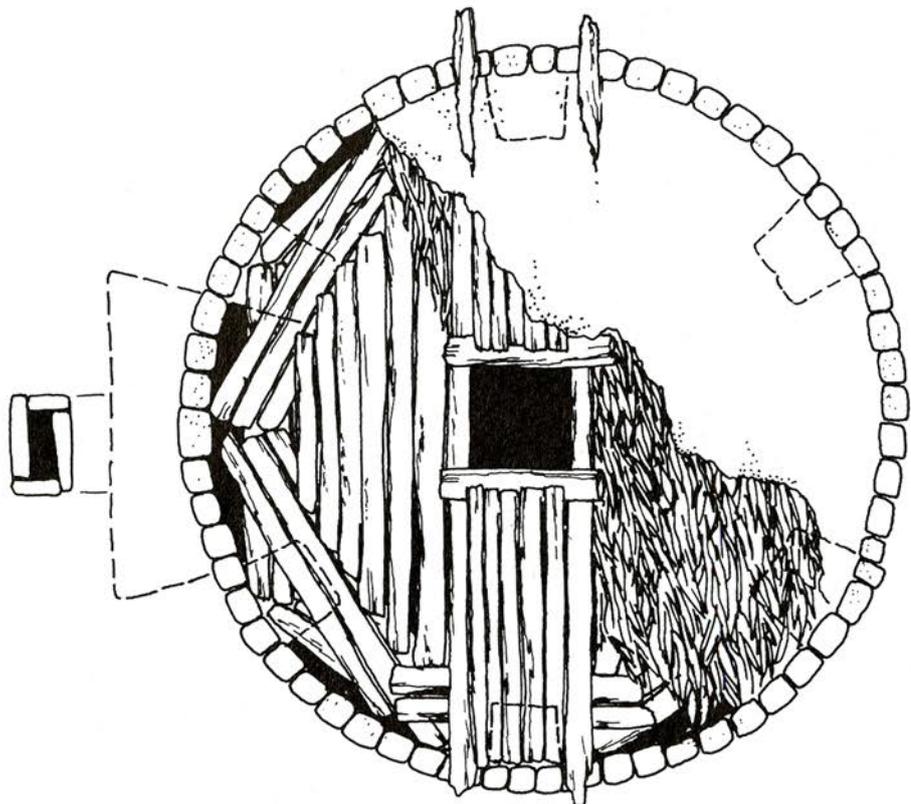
Ceiling plan of a Shupaulovi kiva.
